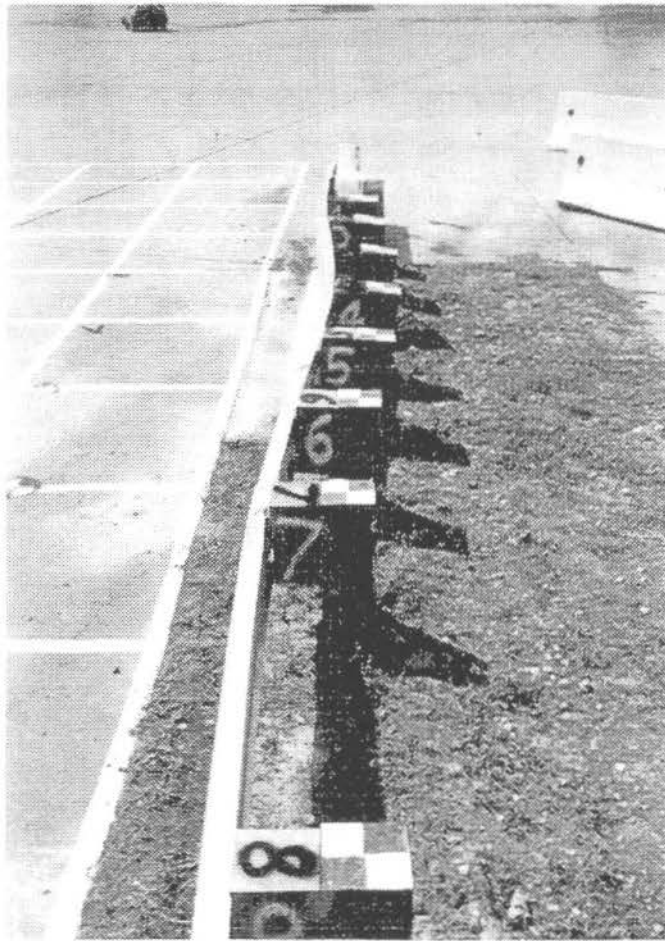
PHOTOGRAPHS OF DAMAGE TO APPROACH GUARDRAIL TRANSITION SECTION.
